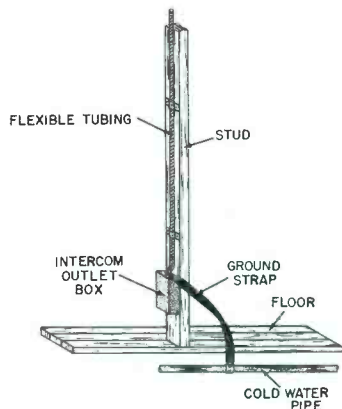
Outlet Box Bonded to Cold Water Pipe.
